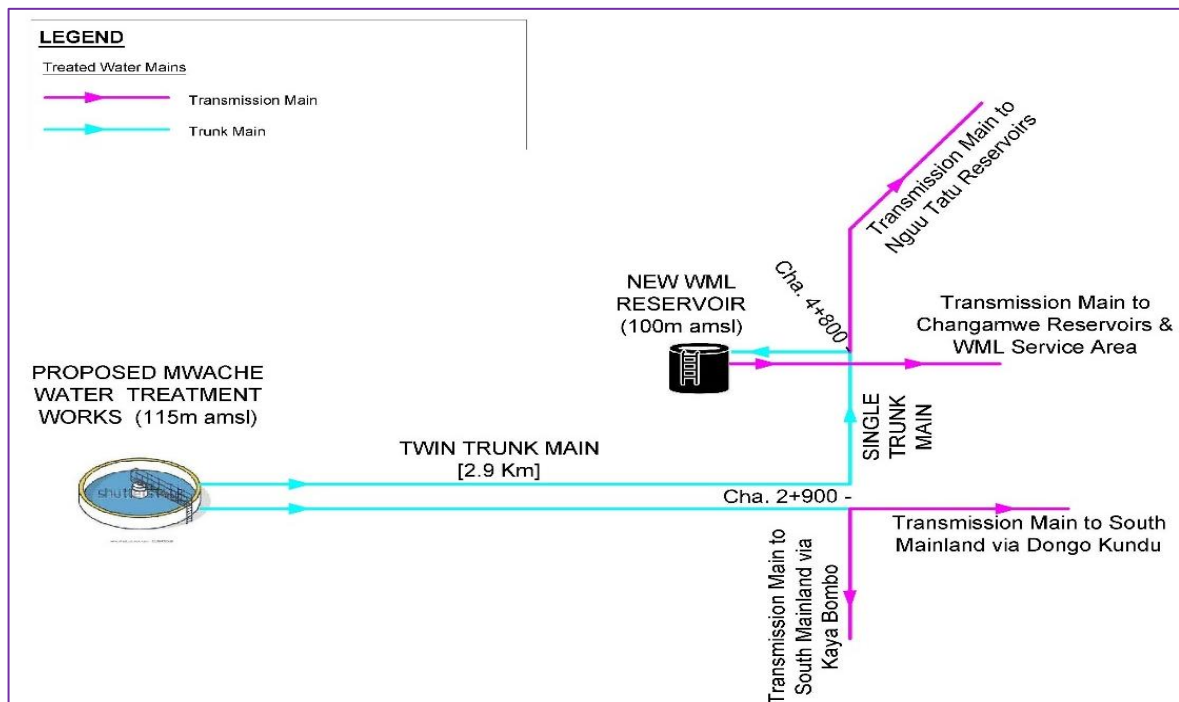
Schematic Layout of the proposed Trunk Main
